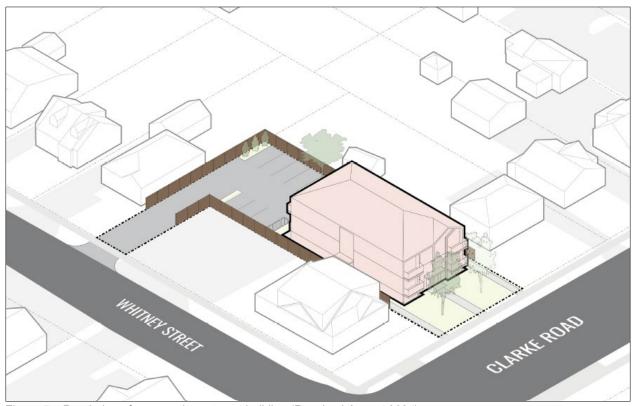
Rendering of proposed apartment building (Received August 2024)
